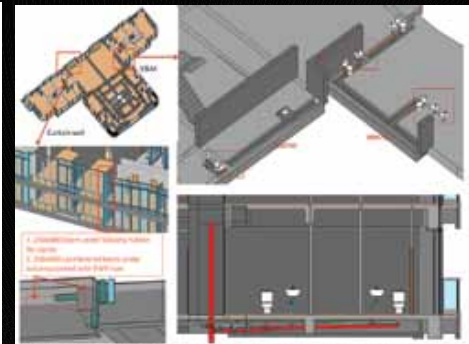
Design coordination of structural & drainage system within curtain glass and outside window wall facade of main entrance
